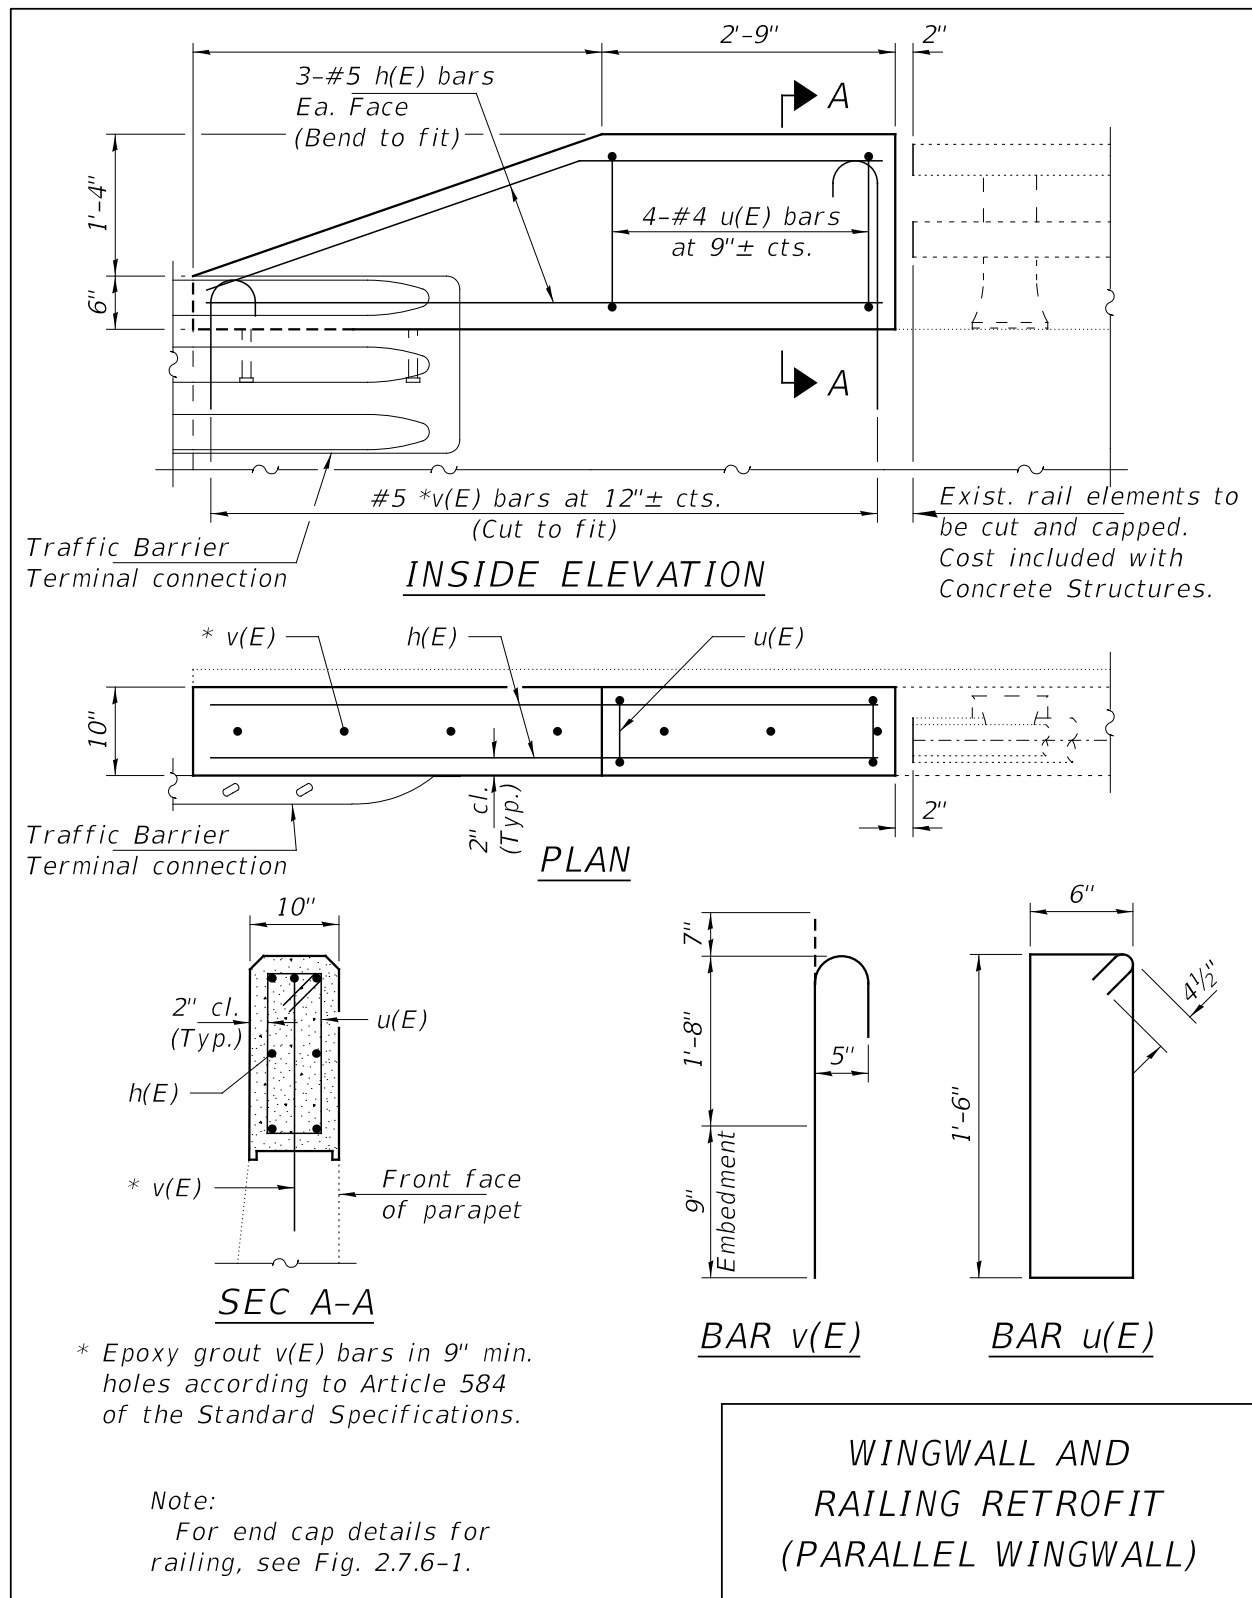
Wingwall and Railing Retrofit (Parallel Wingwall)
